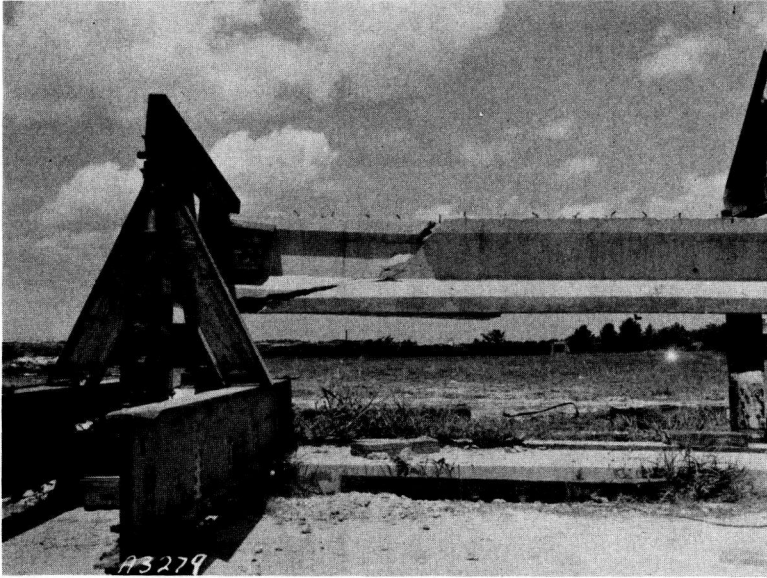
Beam failure, torsion test, pretensioned beam.
